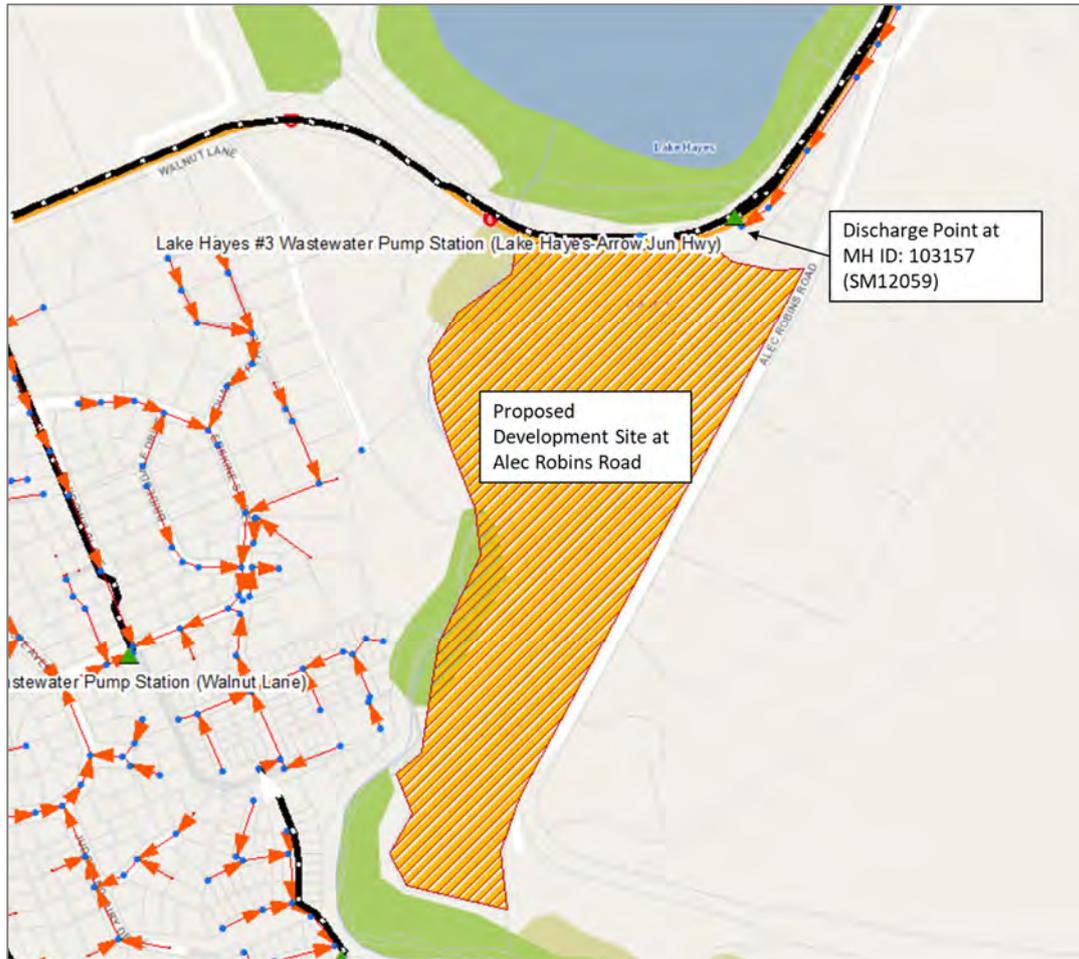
ALEC ROBINS ROAD PROPOSED WASTEWATER CONNECTION
